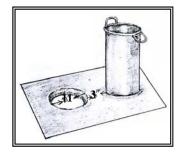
1st Stage: Construction of Improved Double Mouth Cooking Stove with Chimney (*Half underground*)
